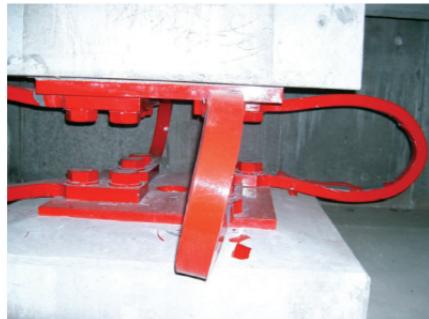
Damage of bolt fasteners of steel dampers
